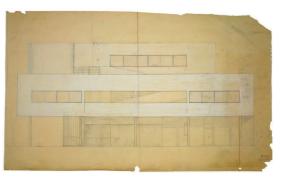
, 2.020 - Plans, (top) sections and elevations (bottom) of Villa Savove, Le Corbusier (1928) • Source: Fondation Le Corbusier, Paris
